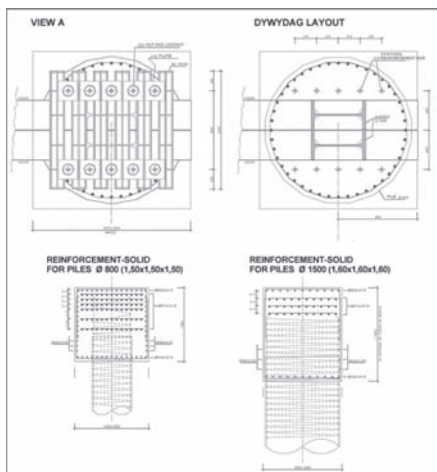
Pile compression test (piles ϕ 800) — Assembly, side view and sections views, details and blocks.
